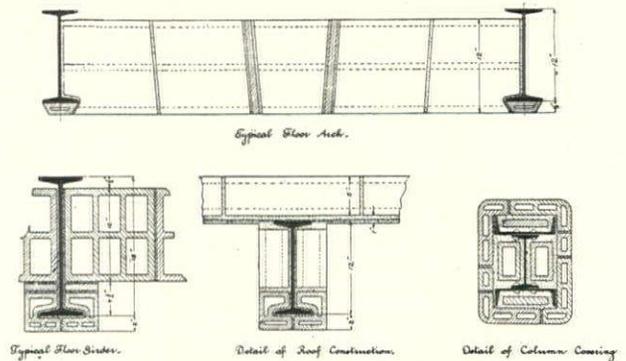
END-PRESSURE FLAT ARCH, ALSO GIRDER, STANCHION AND ROOF FIREPROOFING: CADILLAC AUTOMOBILE FACTORY, DETROIT, MICH.
